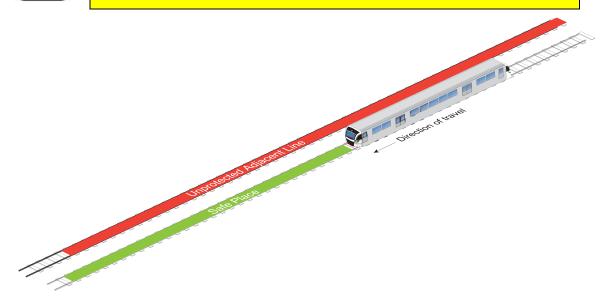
Example of Protection provided by stopped or Restrained Rail Traffic.
